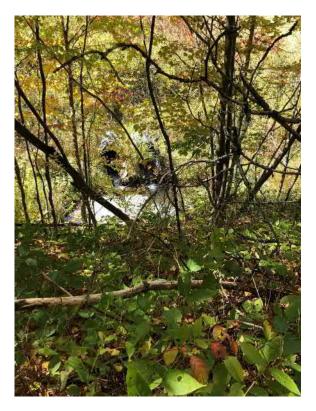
Stream 4 from top of railroad embankment – note double culvert enters separate culvert under railroad.
